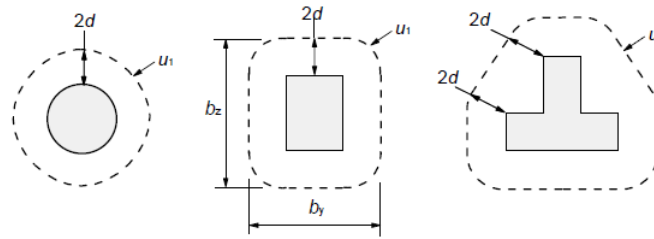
Typical basic control perimeters around loaded areas (Norsk Standard, 2008)
